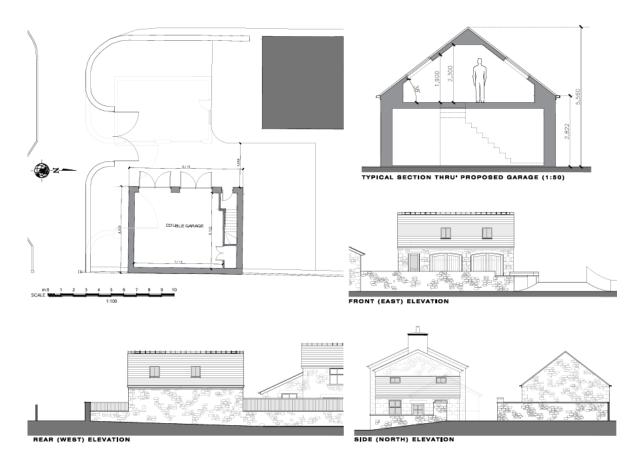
drawing showing the consented garage at Beech House (under planning permission ref no. 3/2016/0664)
